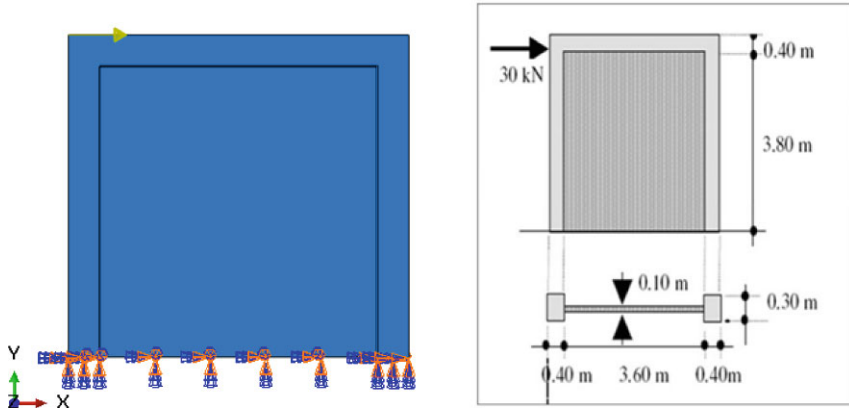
Model designed with ABAQUS. Detailed figure of lateral loading, its point of application, and the dimensions of wall
